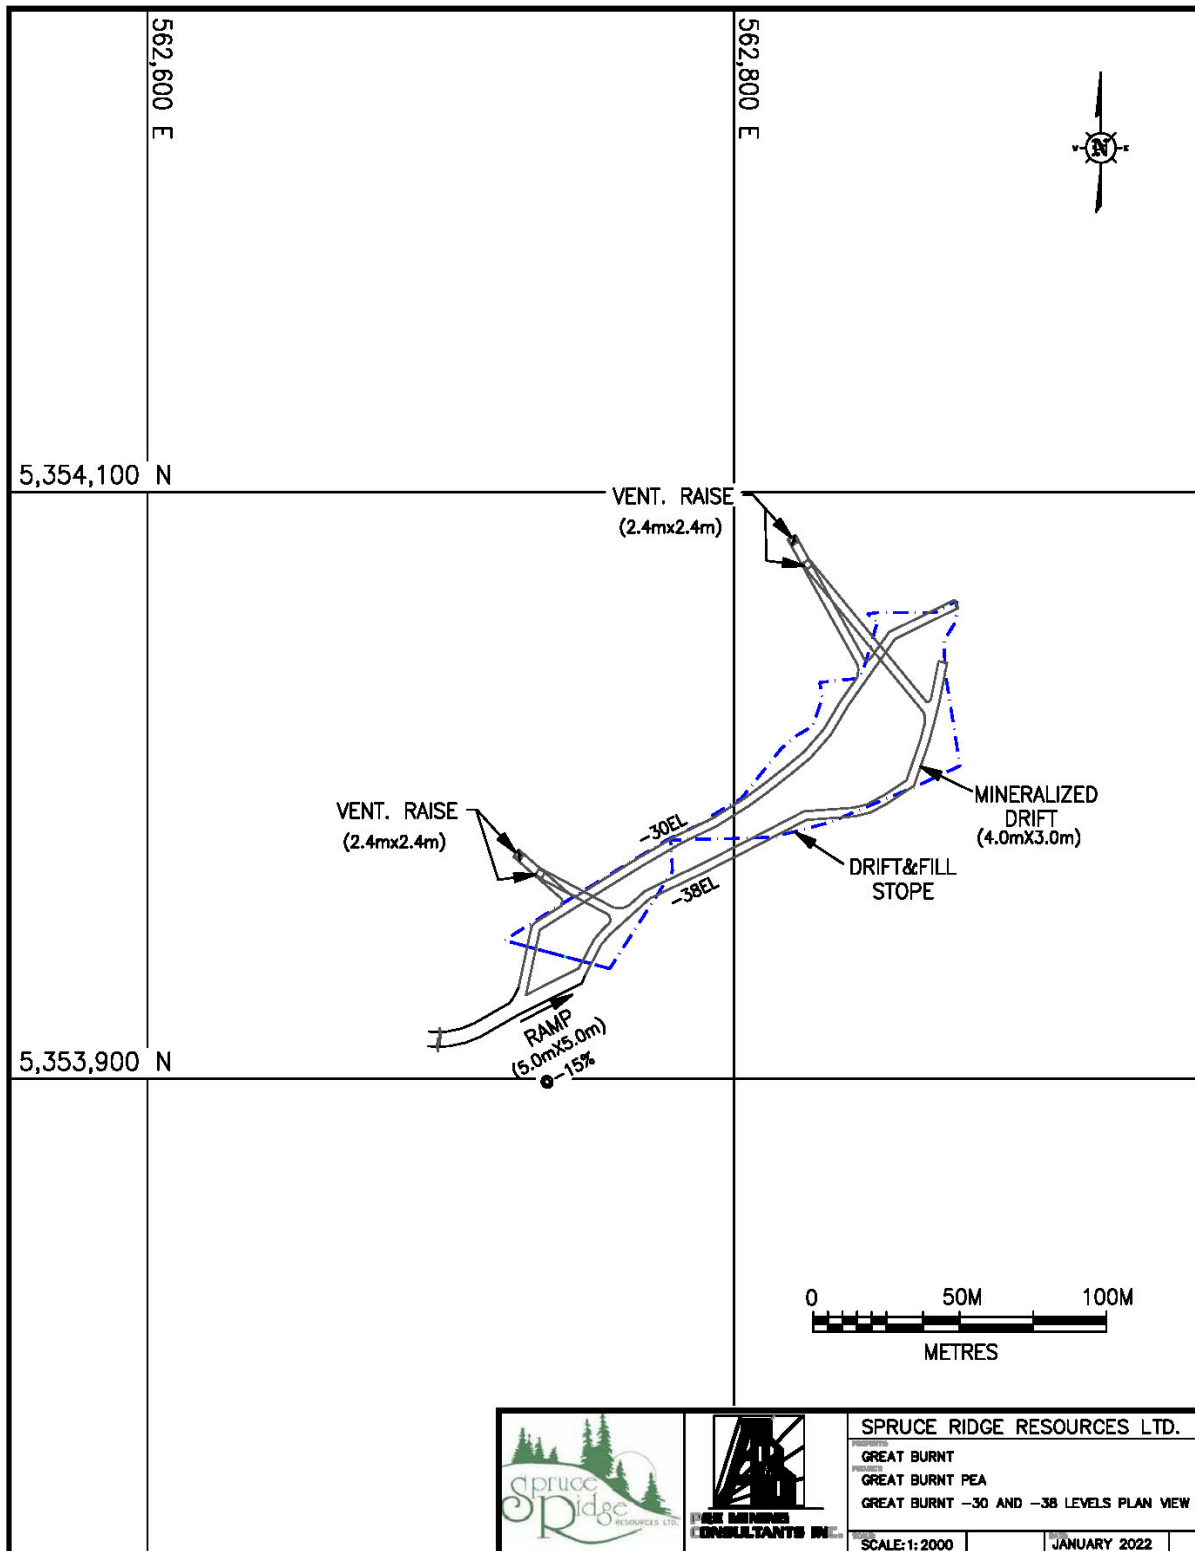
GREAT BURNT -30 AND -38 M ELEVATIONS LEVEL PLAN
